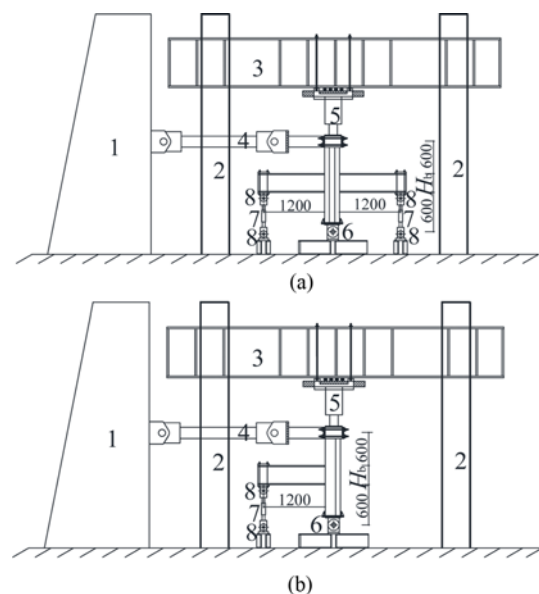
Test Setup: (a) S+ Specimens, (b) ST and SL Specimens (1. reaction wall, 2. reaction frame, 3. anti-force beam, 4. electro-hydraulic servo systems, 5. hydraulic jacks, 6. unidirectional hinged bearing at column end, 7. force sensor, 8. unidirectional hinged bearing at beam end)
